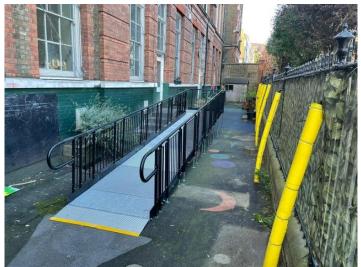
Proposed ramp with powder coated steel handrails and galvanised mesh slope
